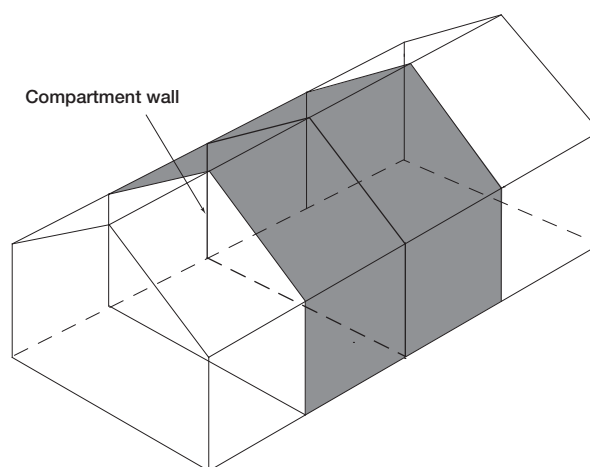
The shaded area indicates the protected zone adjacent to a compartment wall.
